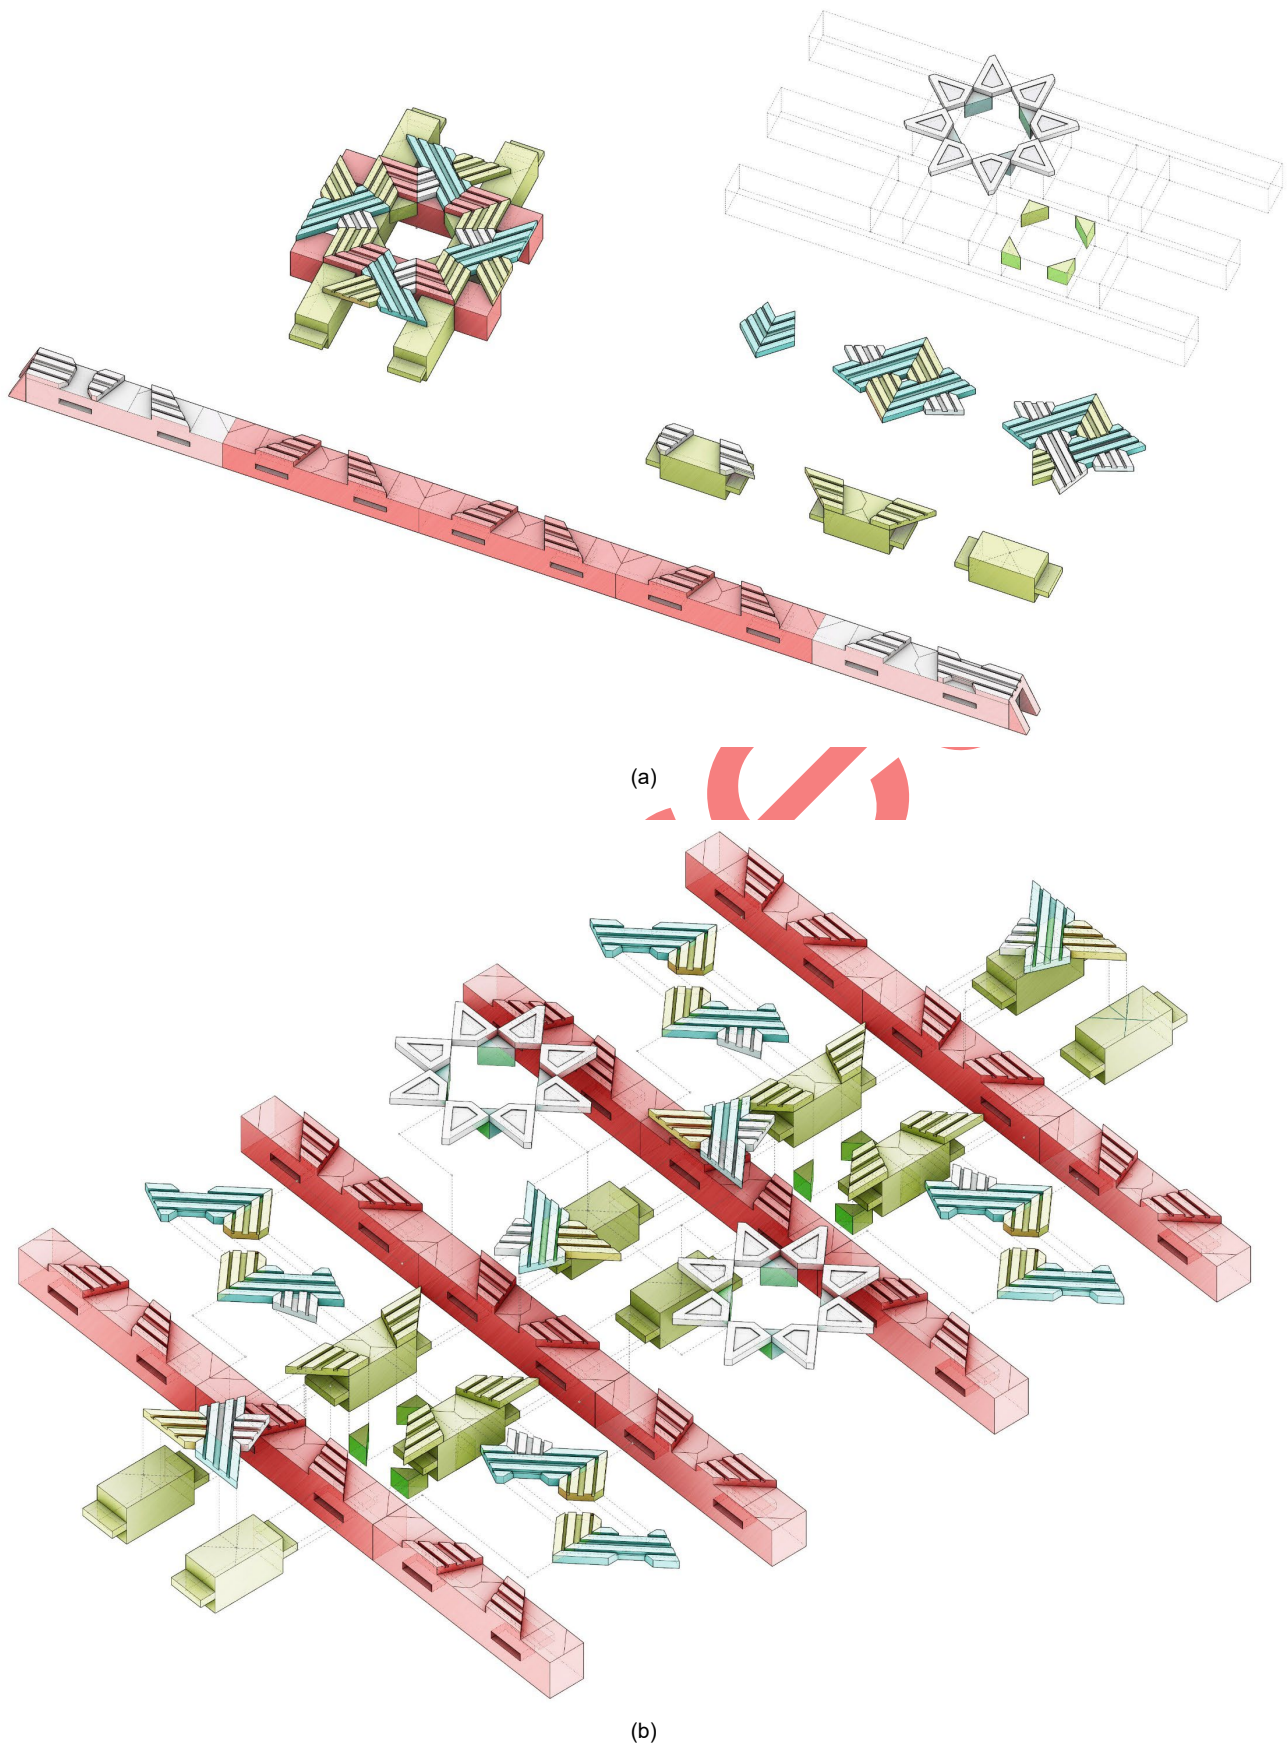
Details of the pieces that form the *almizate* and their assembling system: a) Configuration of one module; b) Assembling of several modules.
